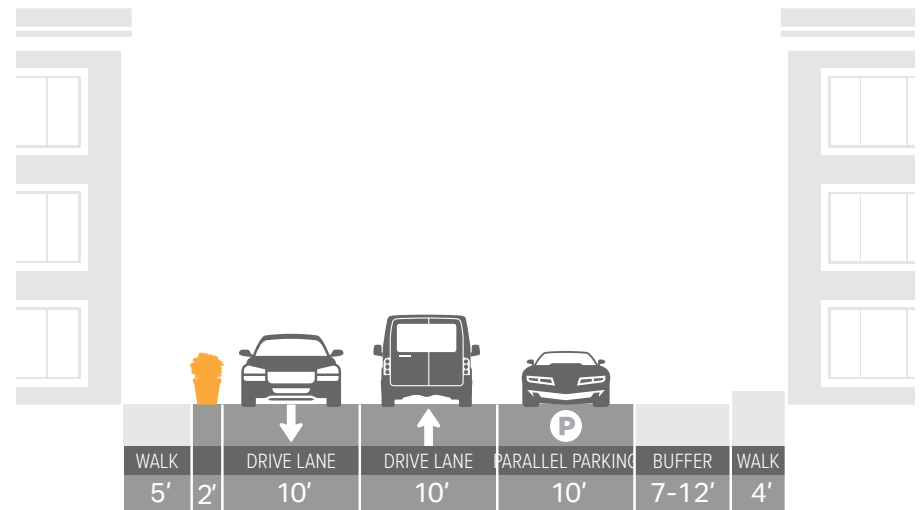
Existing Cross-Section Washington Avenue to Dart Street
